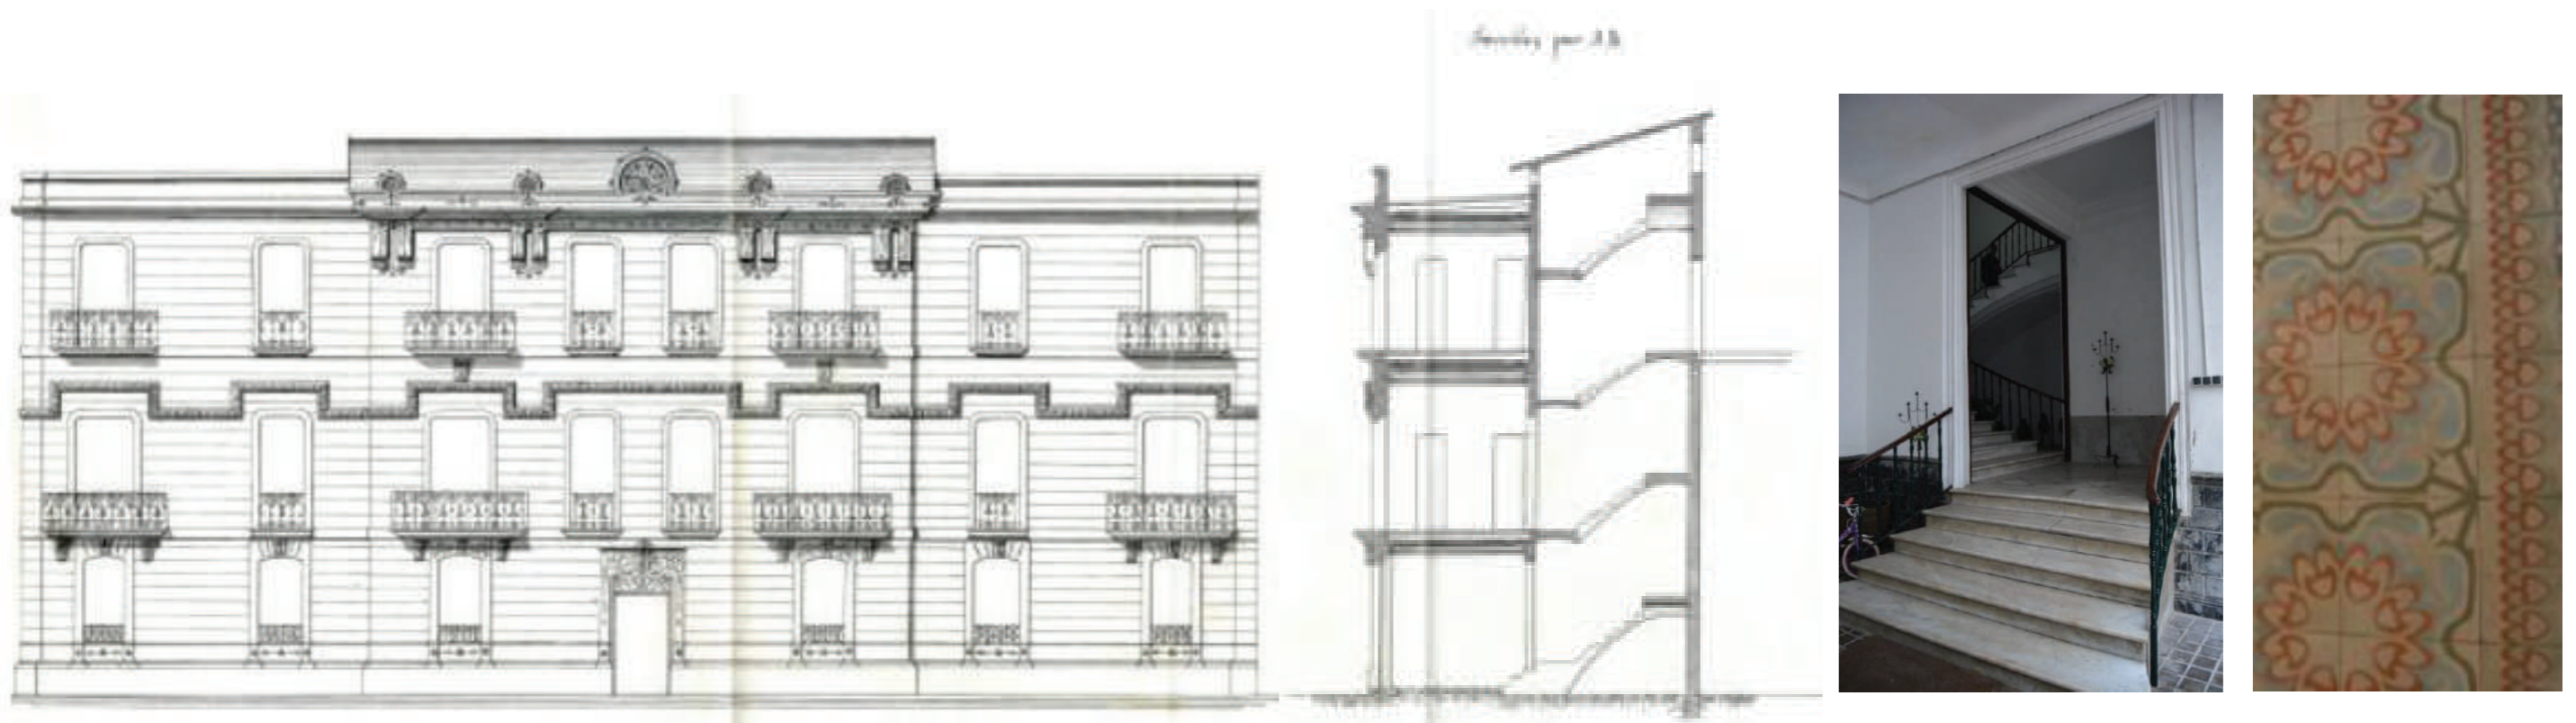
1907. Third great renovation to Modernist and Eclectic Style: south façade, main stairs, and pavements.
